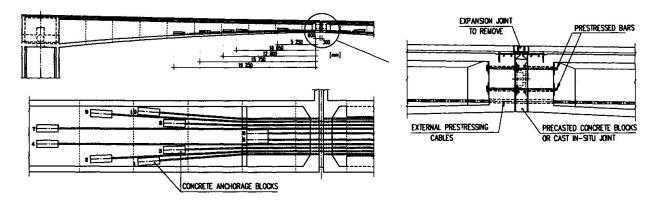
Design solution for a continuos joint: external cables layout and prestressing bars.
